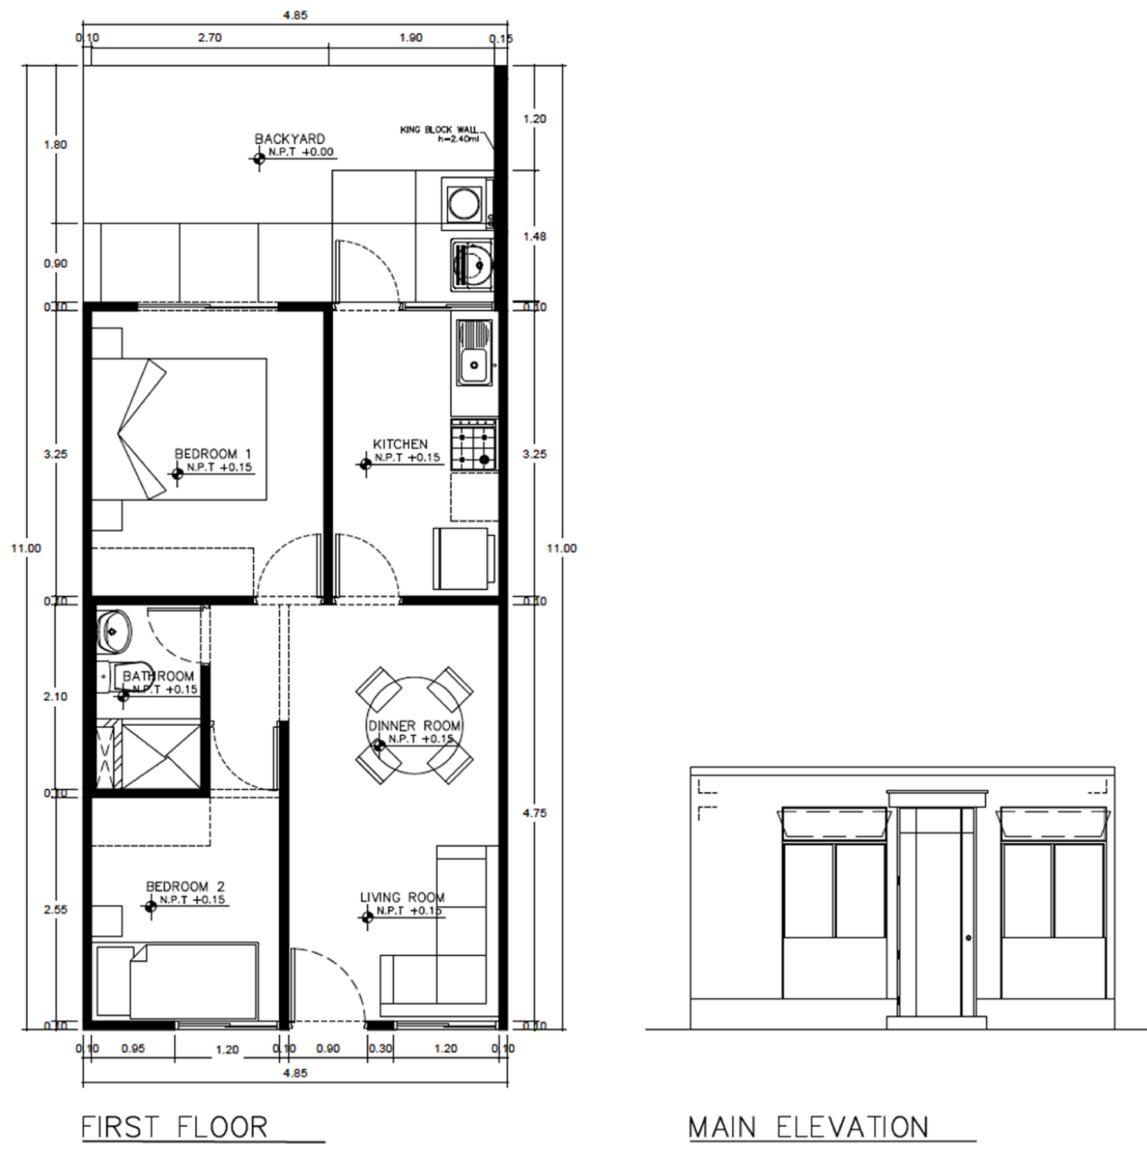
Floor plan and main elevation of the prototype house for MSHP (dimensions in meters).
